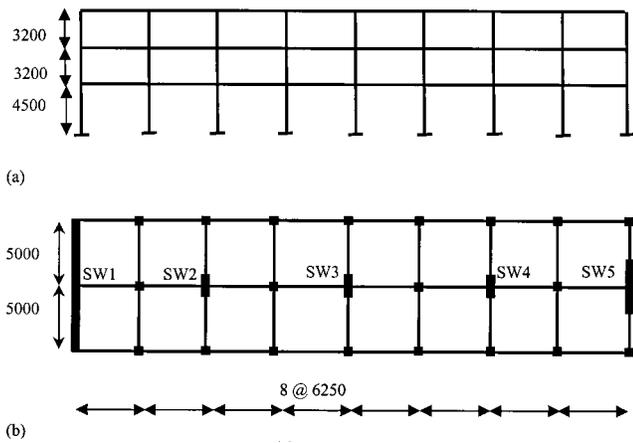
Example of building (a) elevation and (b) its plan (all dimensions are in millimeters)
